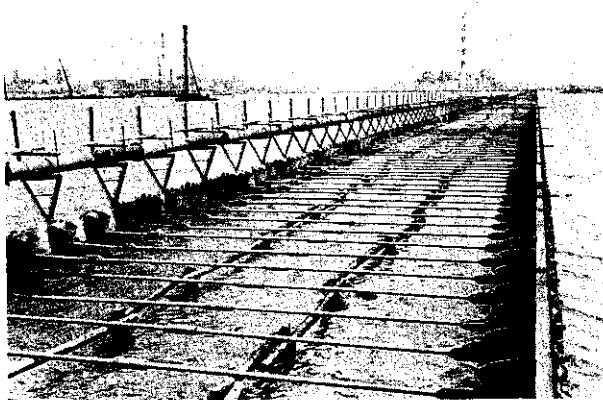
Interlocked steel pipe bulkhead method showing tie rods connecting rows of pipe piles at Mizushima Works
